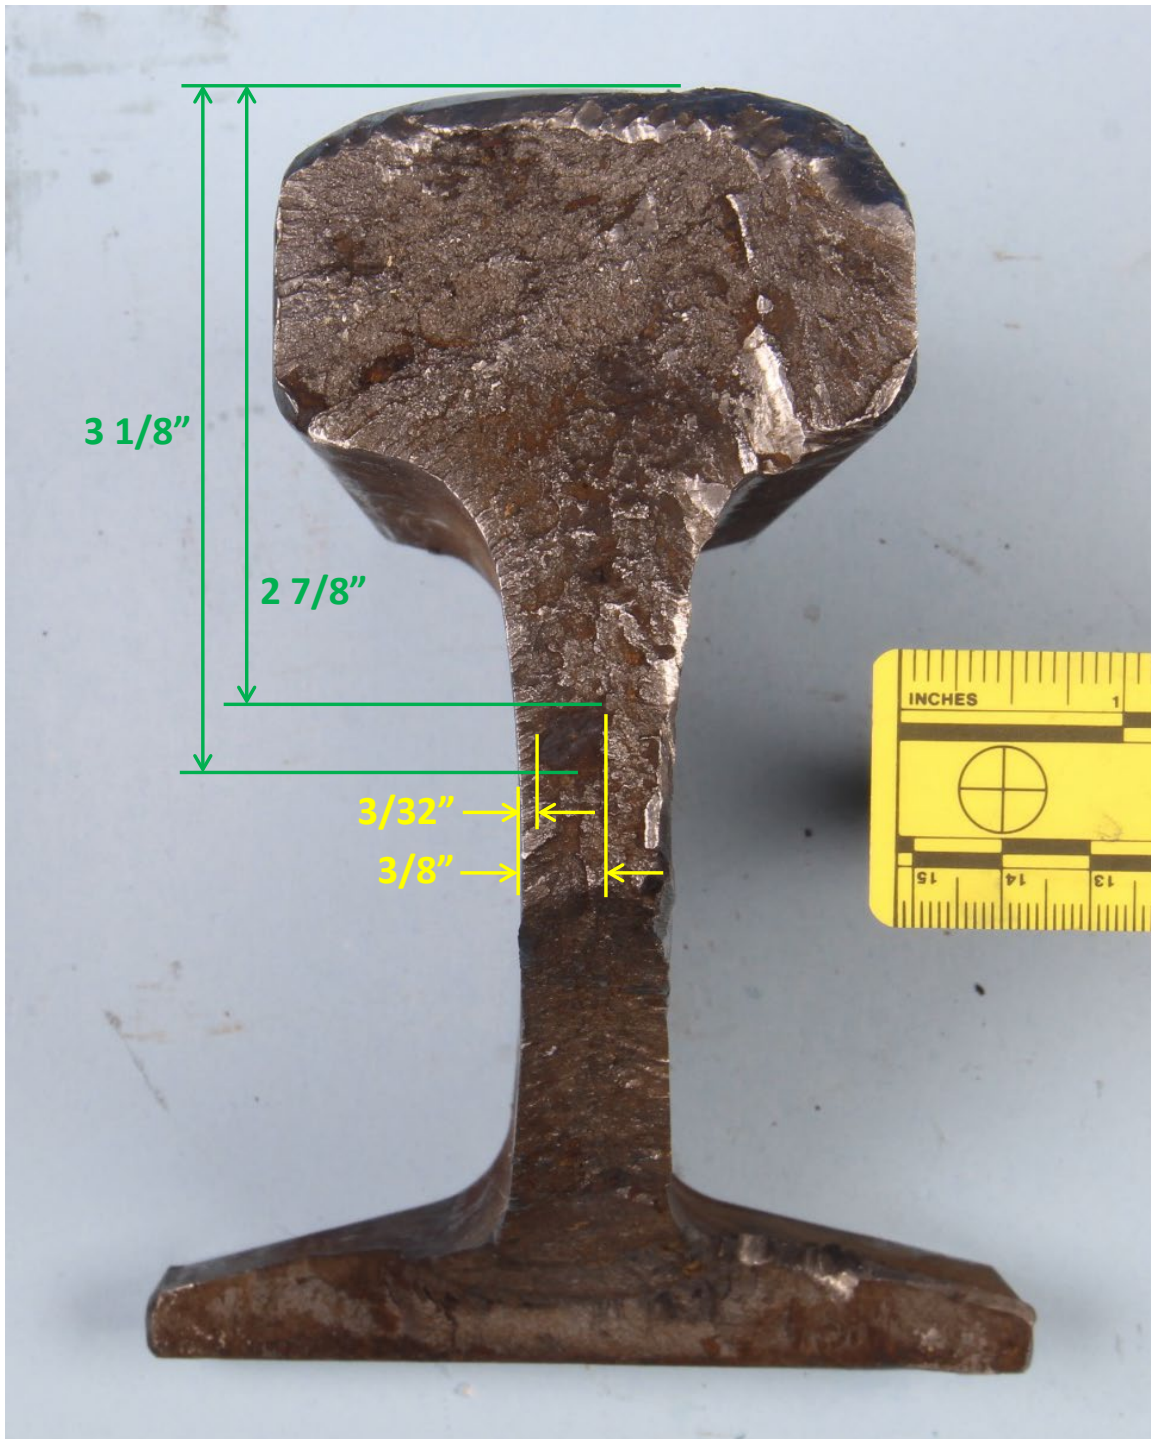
Close-up photo of the web fracture surface of piece 3W with measurements indicating the location of the dark colored anomaly.
